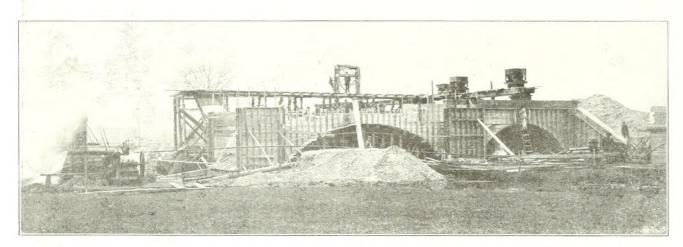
CONCRETE FORMS FOR BIG FOUR BRIDGE AT MUD RUN.
